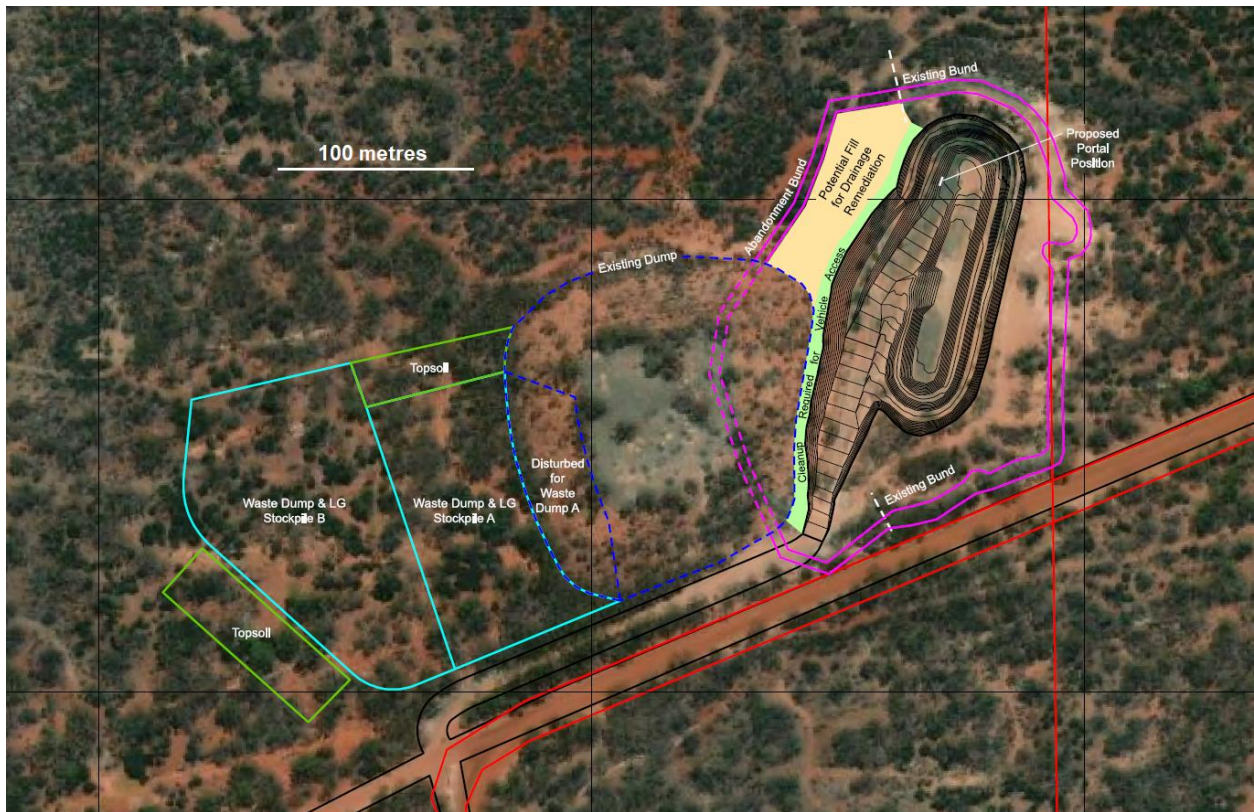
Site plan for the 5A work area showing waste dump extension, western ramp cutback and portal location.
